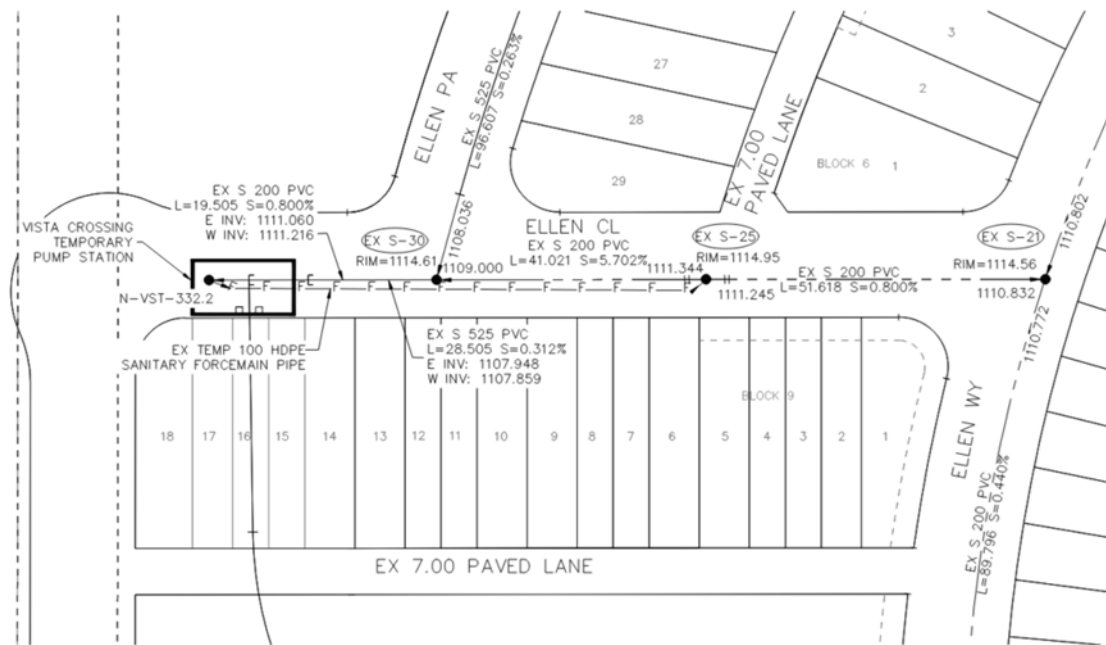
Location of Vista Crossing Temporary Pump Station
